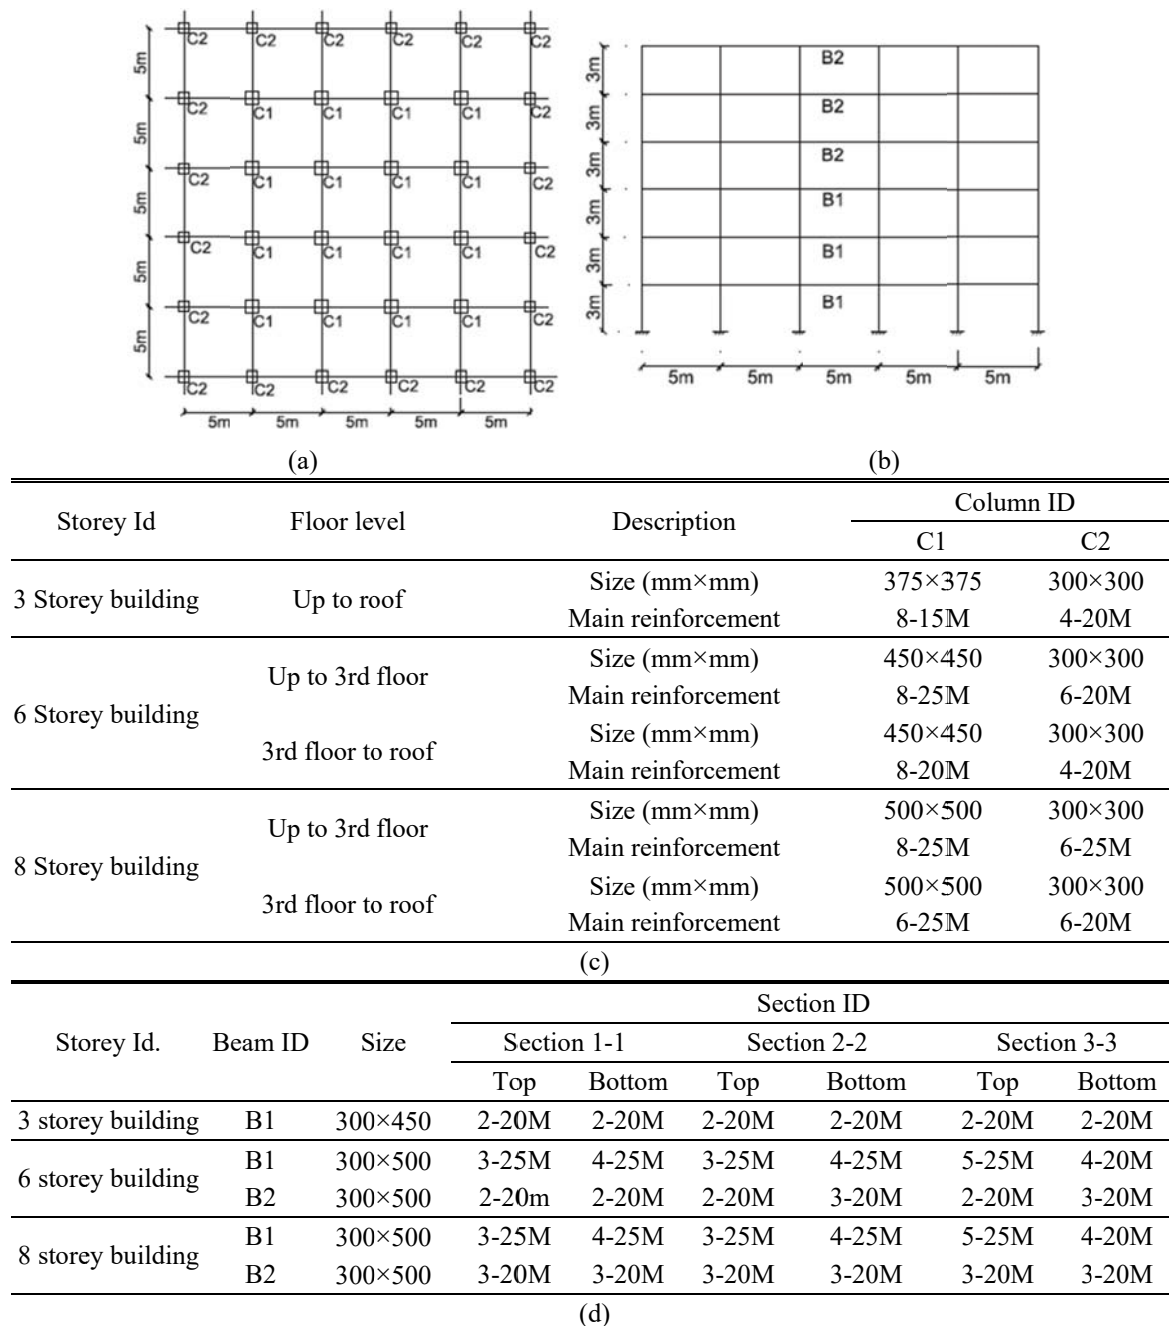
Typical building configuration (a) Plan, (b) Elevation, (c) columns dimensions and reinforcement and (d) beams dimensions and reinforcement, Alam *et al.* (2012)
